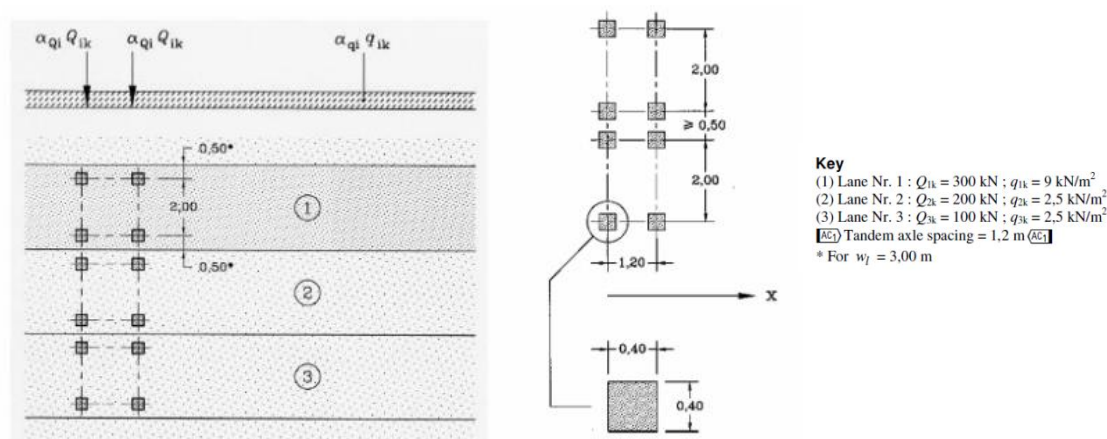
Application of load model 1 (NA to BS EN 1991-2: 2003)
